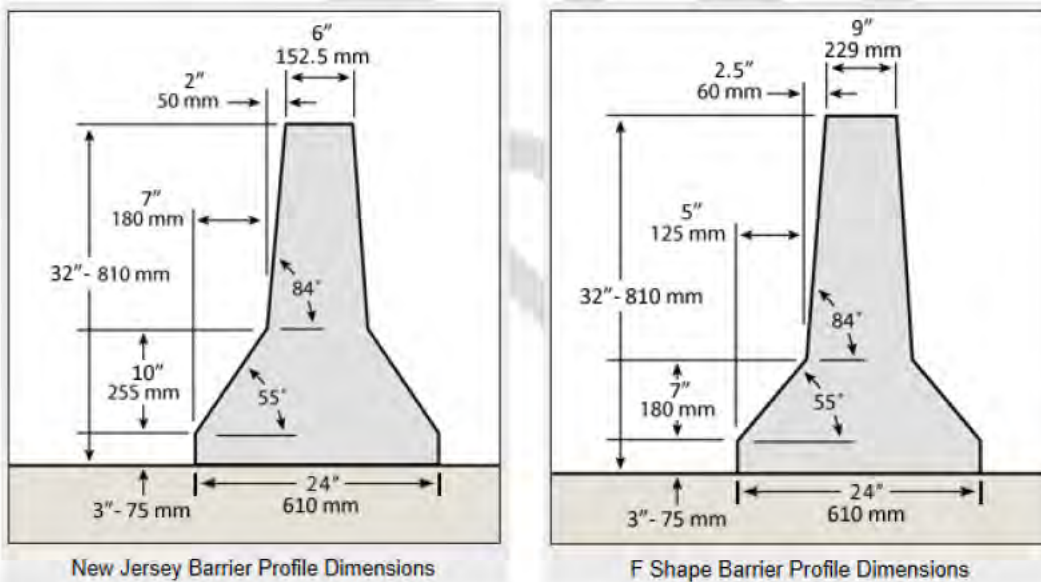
New Jersey Type Concrete Barrier v F-Shape Concrete Barrier
